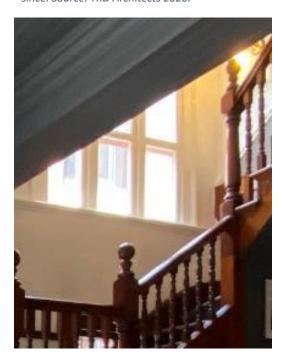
View from G.11 up into the stairhall above (1.02). From first floor level upwards, the stair is highly intact. Source: TKD Architects 2020.
